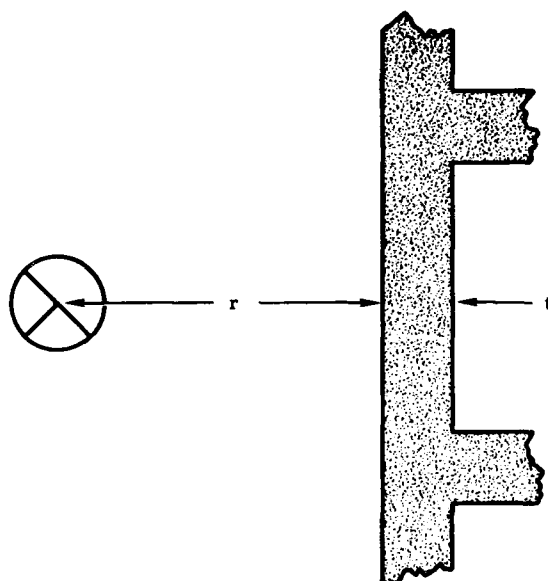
Damage to Reinforced Concrete Wall Panels from TNT Explosions in Air
